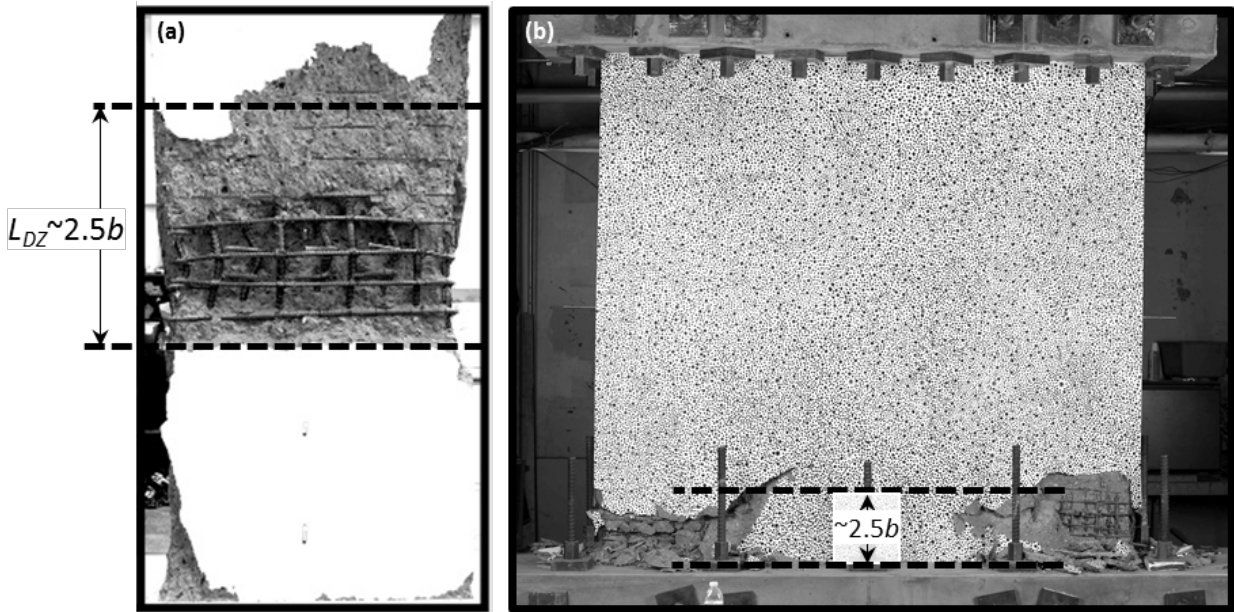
(a) Photo of boundary element specimen W7 taken at end of test showing damage concentrated primarily over a height 2.5 times the wall thickness; and (b) photo of wall panel specimen WP1 taken at end of test showing damage at boundaries concentrated over a height of 2.5 times the wall thickness.
